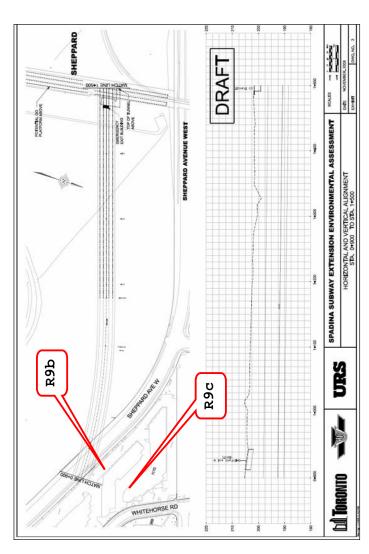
PLAN AND PROFILE OF THE PROPOSED SUBWAY ALIGNMENT
